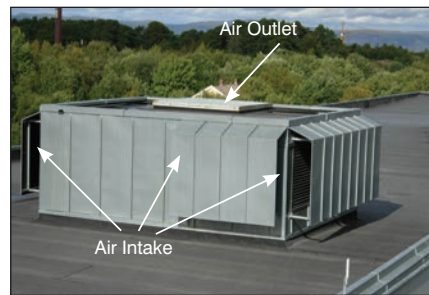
Shielded fresh air ventilation intakes on university building roof. Vertical side intakes and horizontal top outlet.
